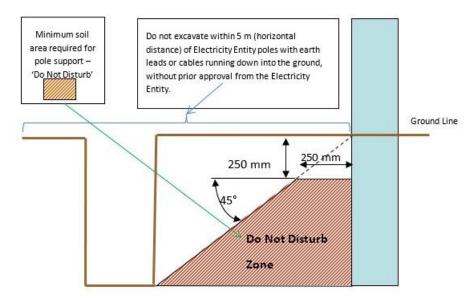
Do Not Disturb Zone requirements when excavating near poles
